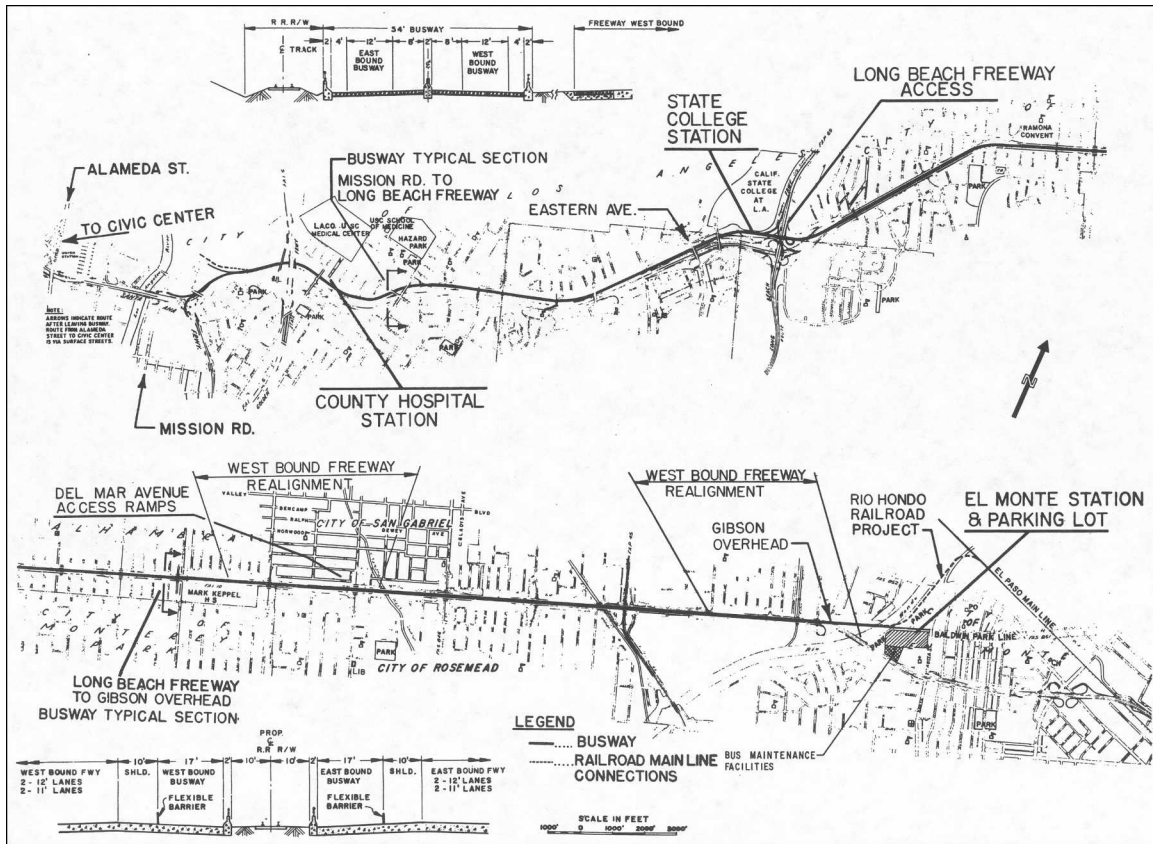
General Plan and Typical Cross Sections of El Monte Busway
